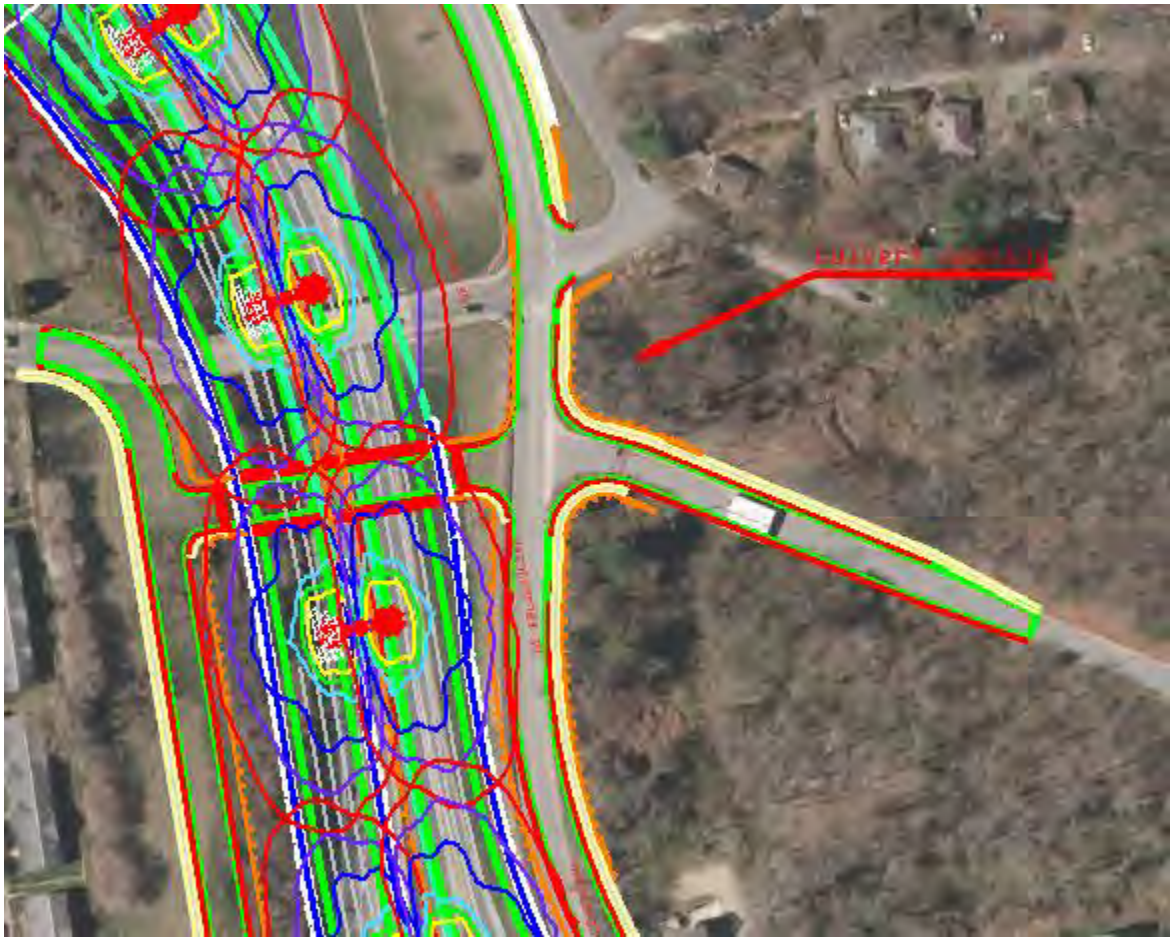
Mitigation lighting layout at Hill Street culvert inlet.
